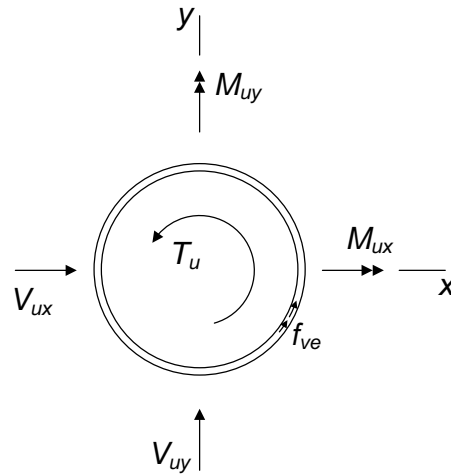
Representative circular tube cross-section profile showing cross-section forces and corresponding element stresses.
